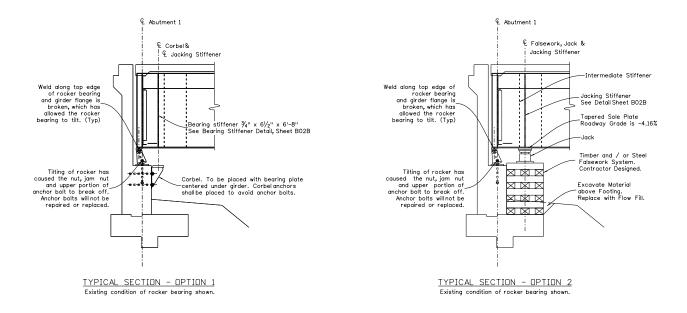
(M)-4 Sample Details for Jacking and Bearing Resetting
